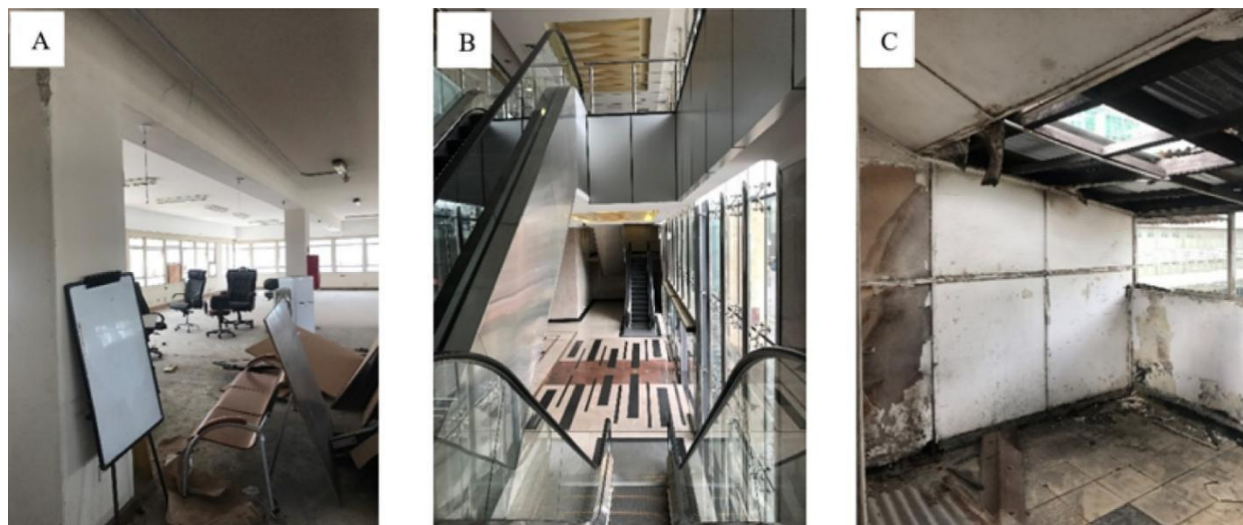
Interiors of the buildings; [A]- Unoccupied office space in the IPS building, [B]- Contemporary interiors of the entrance lobby into PSSSF twin towers office building, and [C]- Deteriorating roof and interior spaces in the HOSCO building (Source: Author, 2021)
